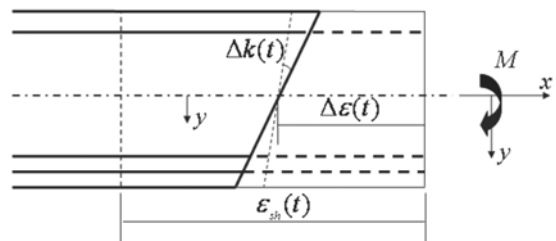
The strain of the reinforced concrete section caused by drying shrinkage
